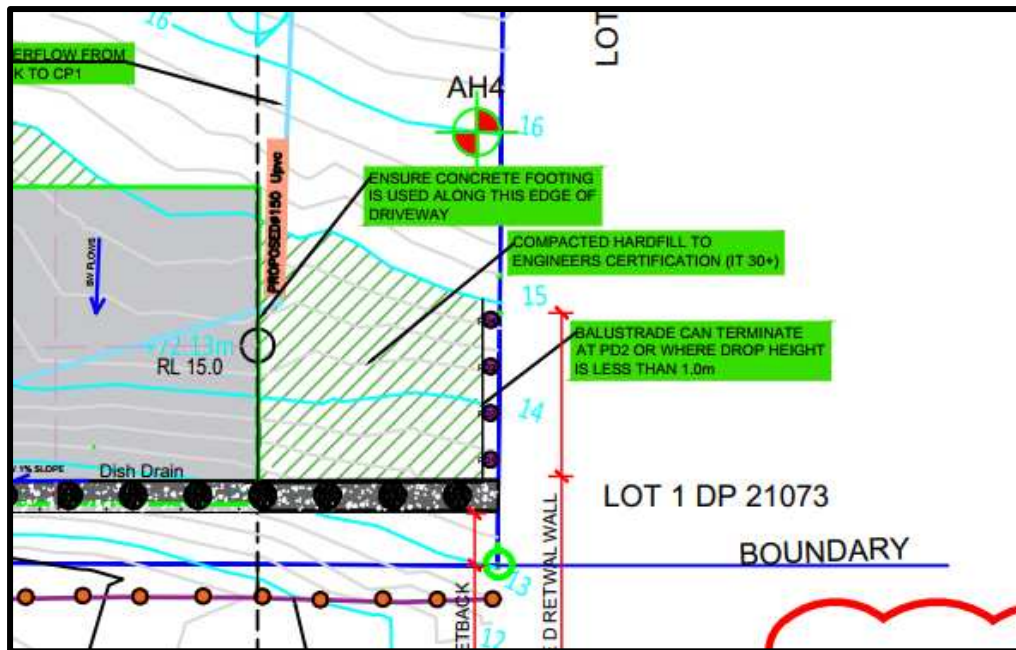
Snip of SR2B of the Plan Set showing location of subject retaining wall.
